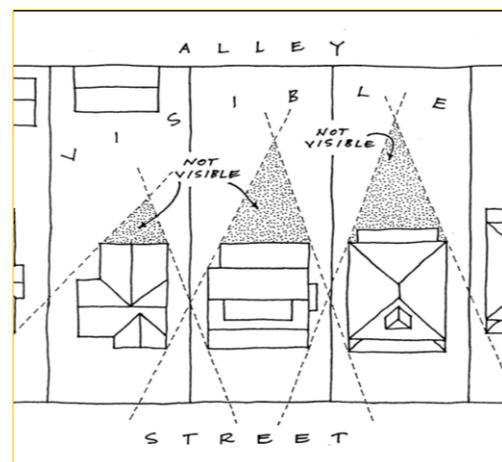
This image appears in all the NCZO design guidelines. *The caption reads: Image to the right shows the area in which new construction would not require a Preservation Permit. All construction outside of the area will be reviewed.
